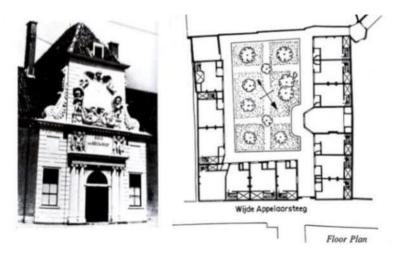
Hofje Entry View and Layout Plan (Beyer & Nierstrasz, 1967)
